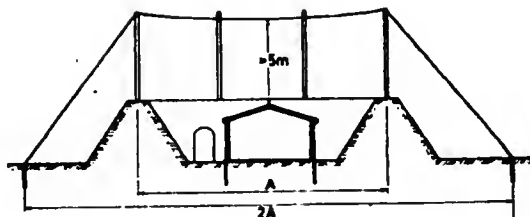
Installation of a protective network on wooden poles over a building used for the manufacture of explosives.
